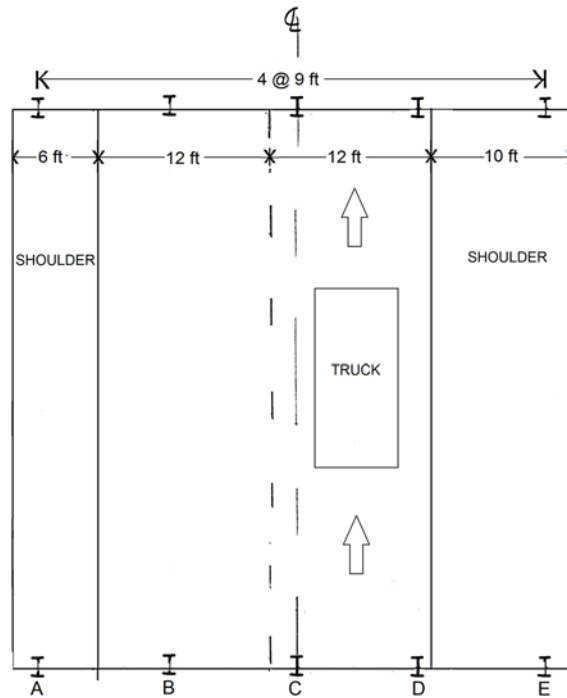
Schematic of bridge lanes and girders for bridges A-6243 and T-130
